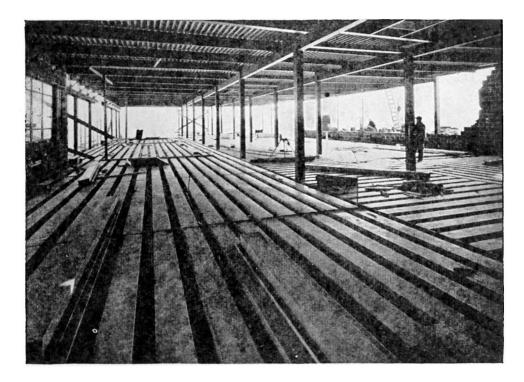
Light-gauge steel floor panels and roof decks on conventional steel frame for school building (Detroit Steel Products Co.)
